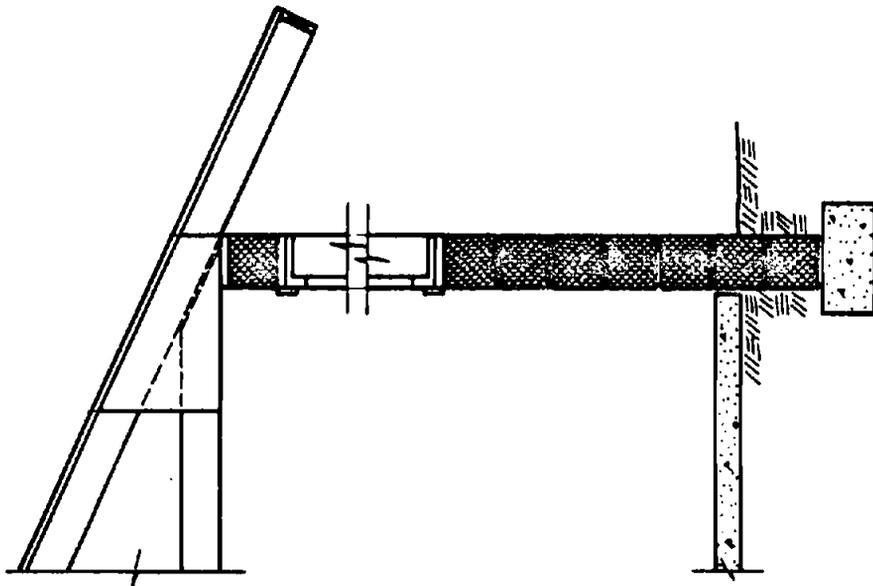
Typical 24-ft-wide (7.3-m) building.
